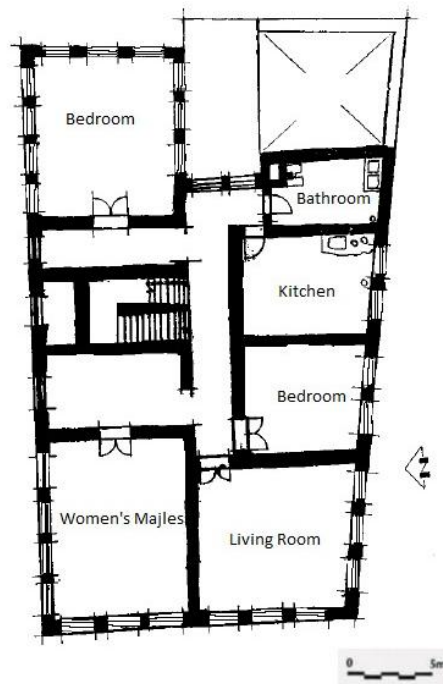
Bamansur House (Third Floor) Mukalla (Al-Maashi, 1998)
